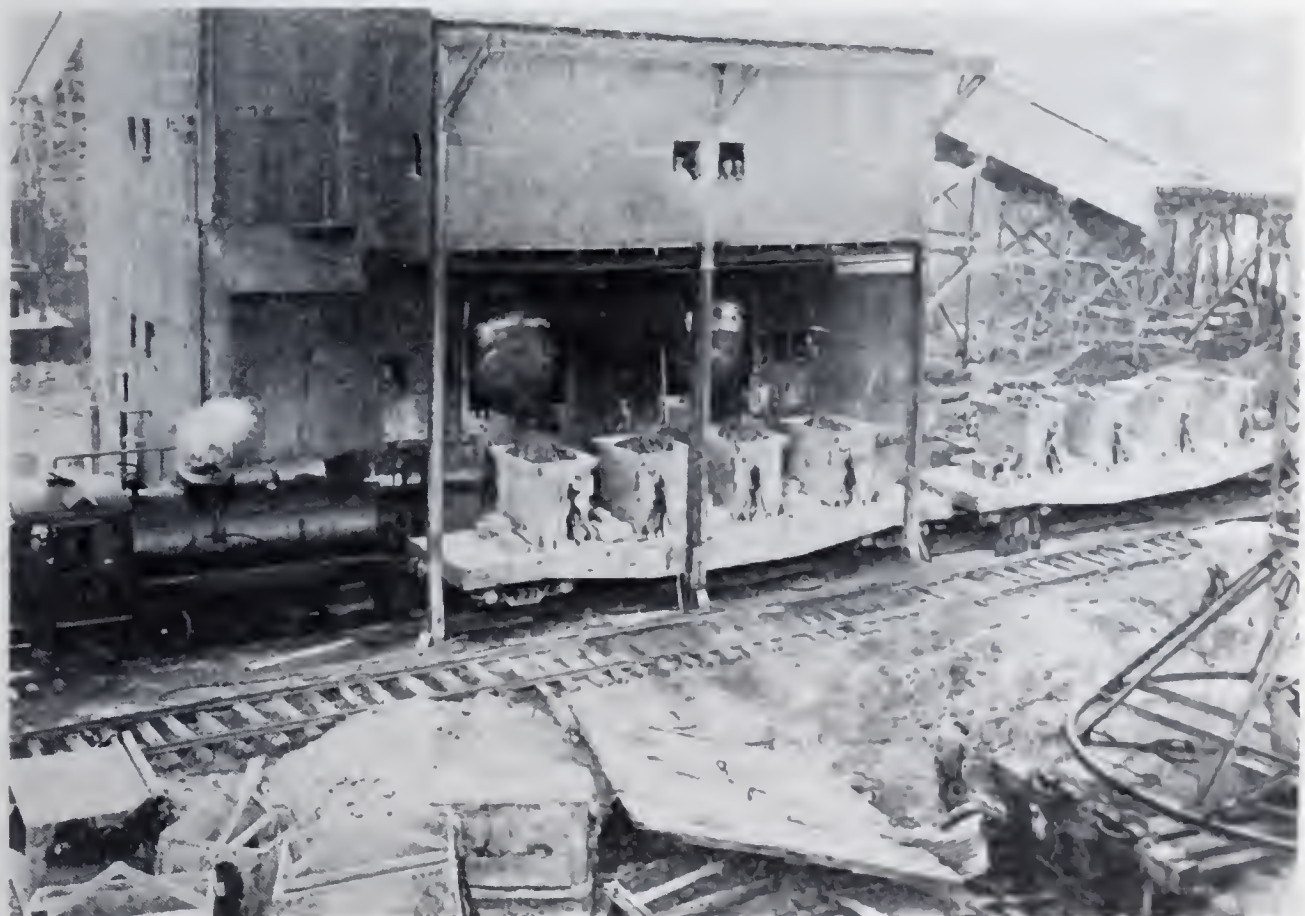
Typical Concrete Train Being Loaded at Mixer Plant.
